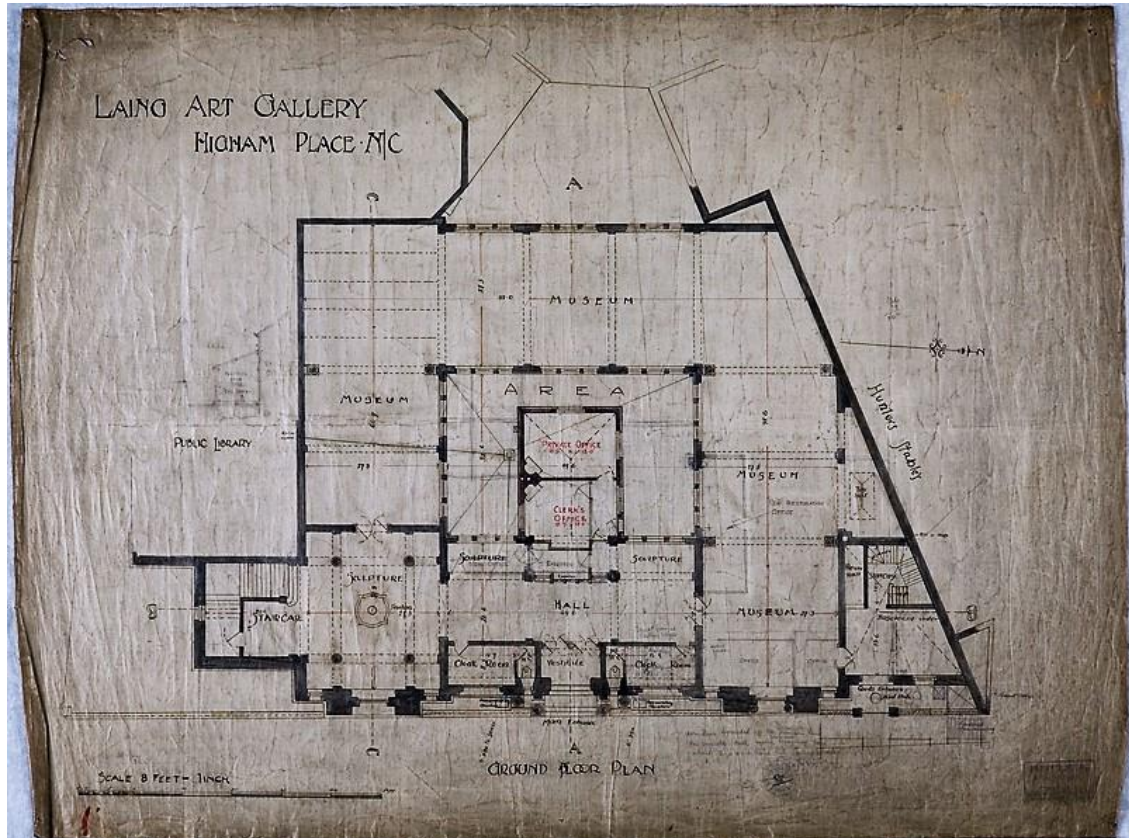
Laing Art Gallery ground floor plan. Cackett and Burns Dick, 1901.
